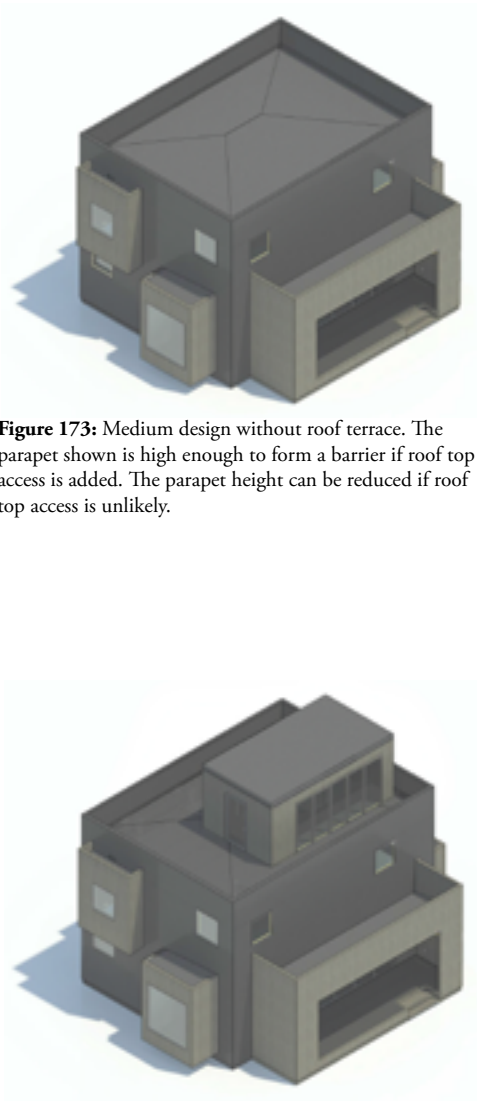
Similar to the large design a roof top access can be included in the initial build or added at a later date.
